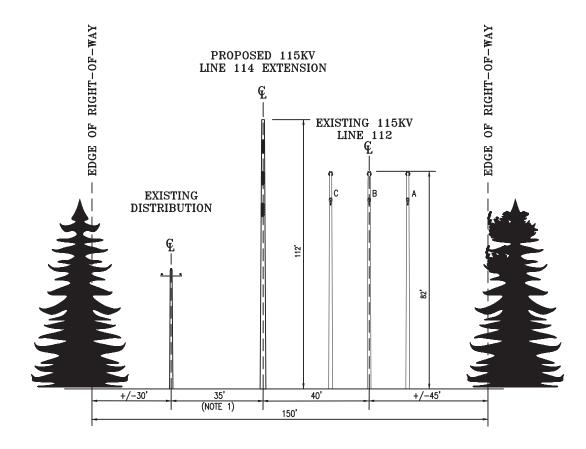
Typical ROW Cross-Sections / Plan & Profile Drawings
